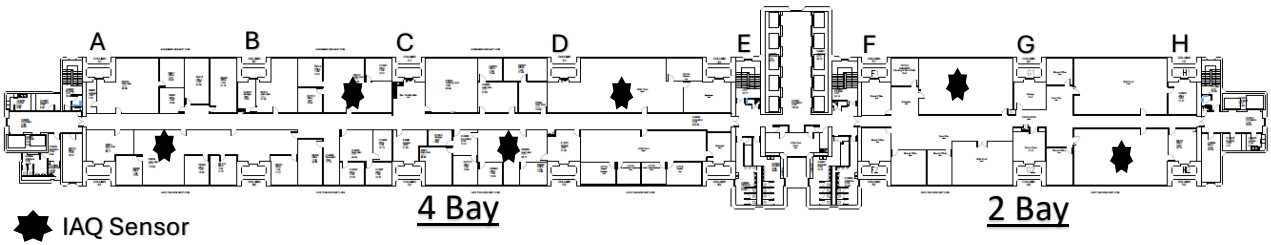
Tower Building proposed sensor positioning 22nd floor (6).
